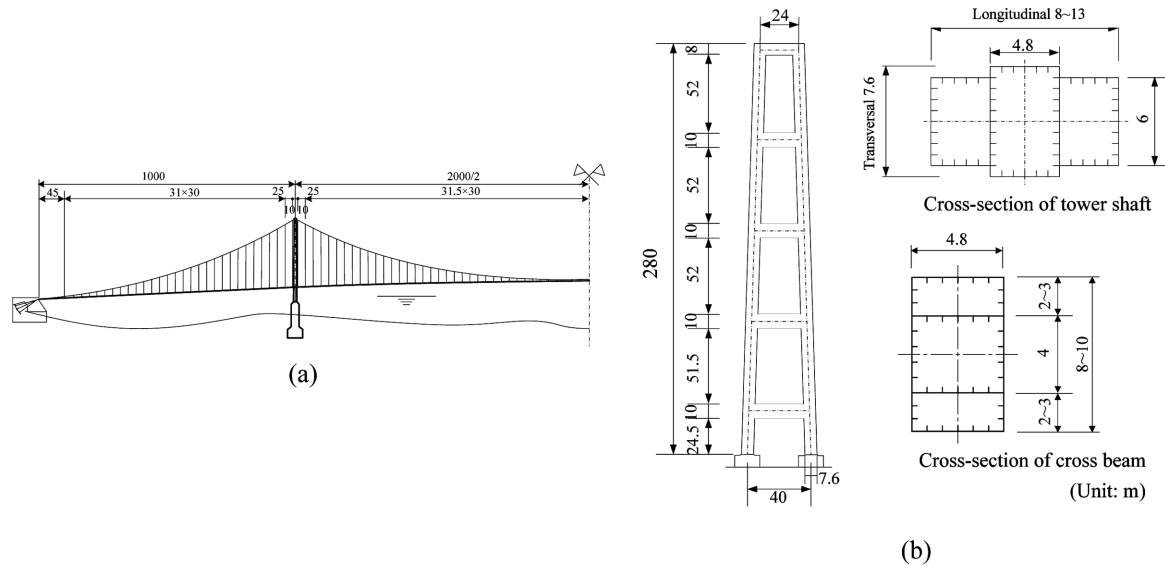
The suspension bridge model: (a) side view of the bridge (half bridge) and (b) front view of the tower and cross-section of tower shafts and cross beams
